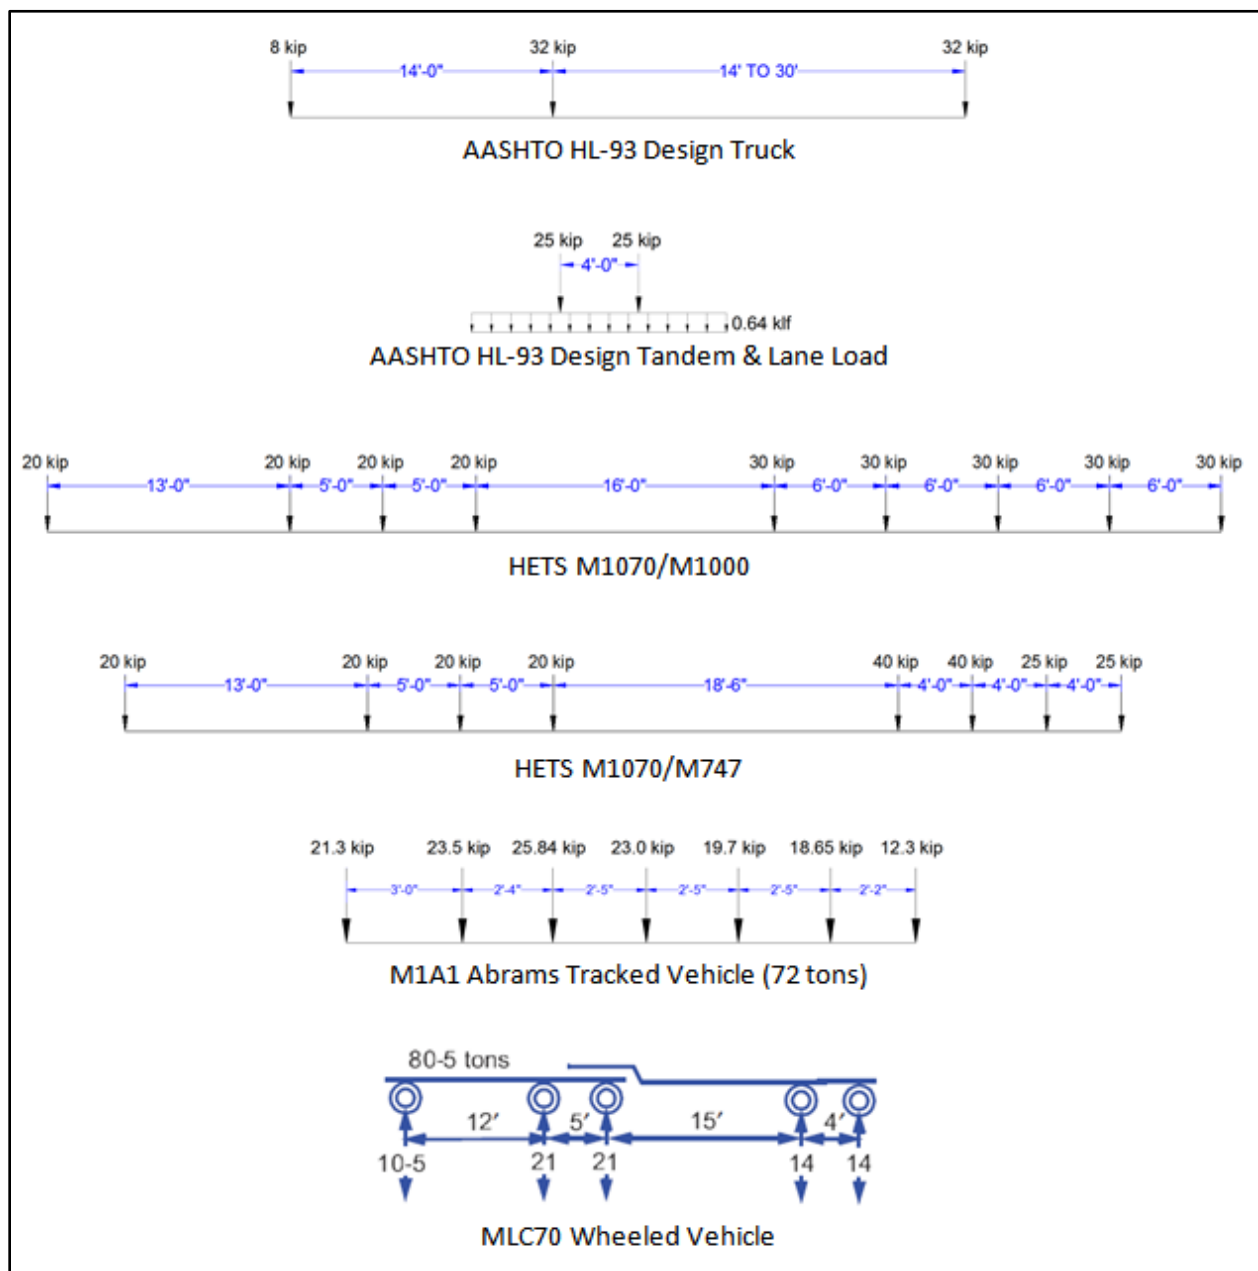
Bridge No. 4 load rating vehicle configurations.
